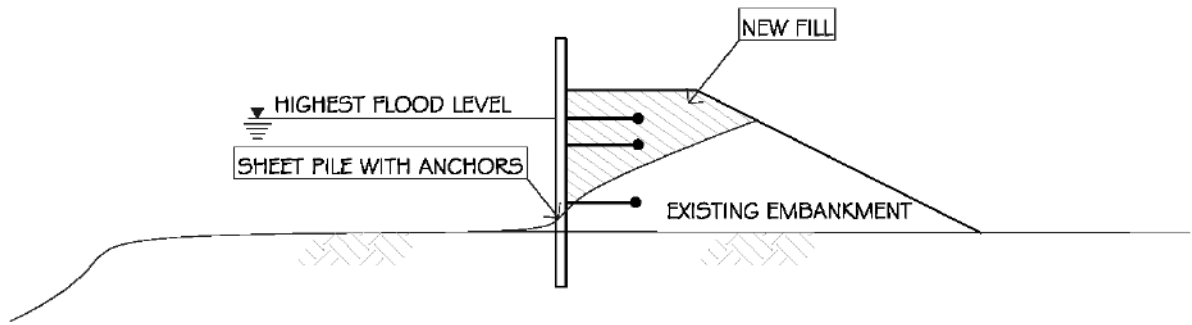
Option 3: Construction of Sheetpile or Concrete retaining Wall
